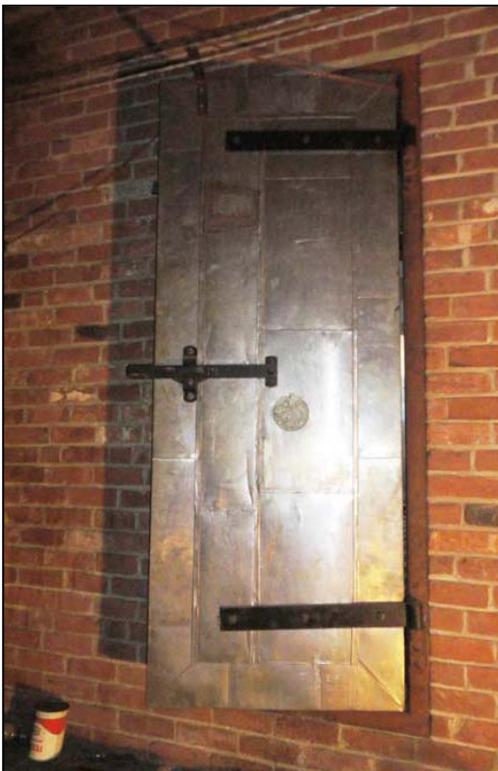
Building 27 attic, main block, interior brick partition for elevator shaft and metal doorway, 2010.
